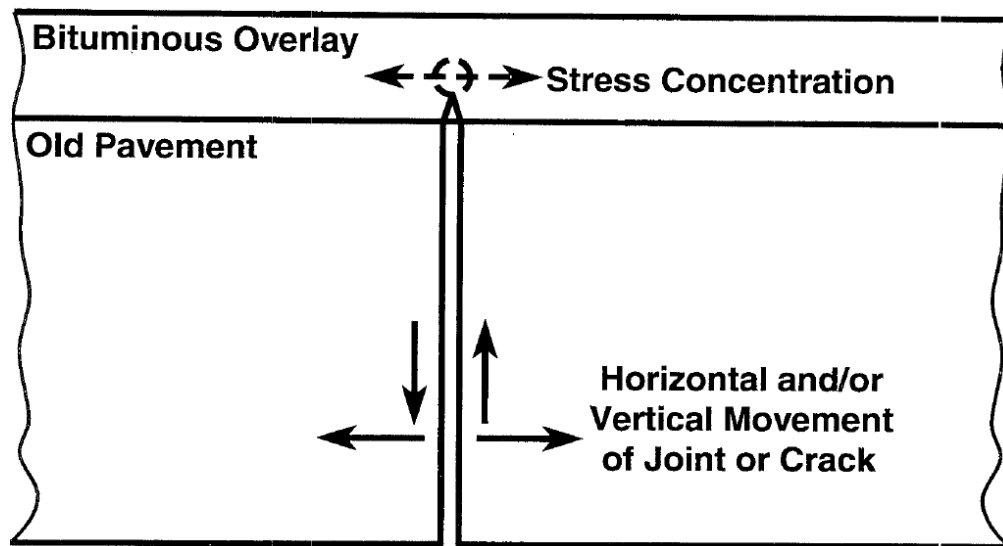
How reflective cracking starts from the old PCC pavement (Janisch and Turgeon 1996)
